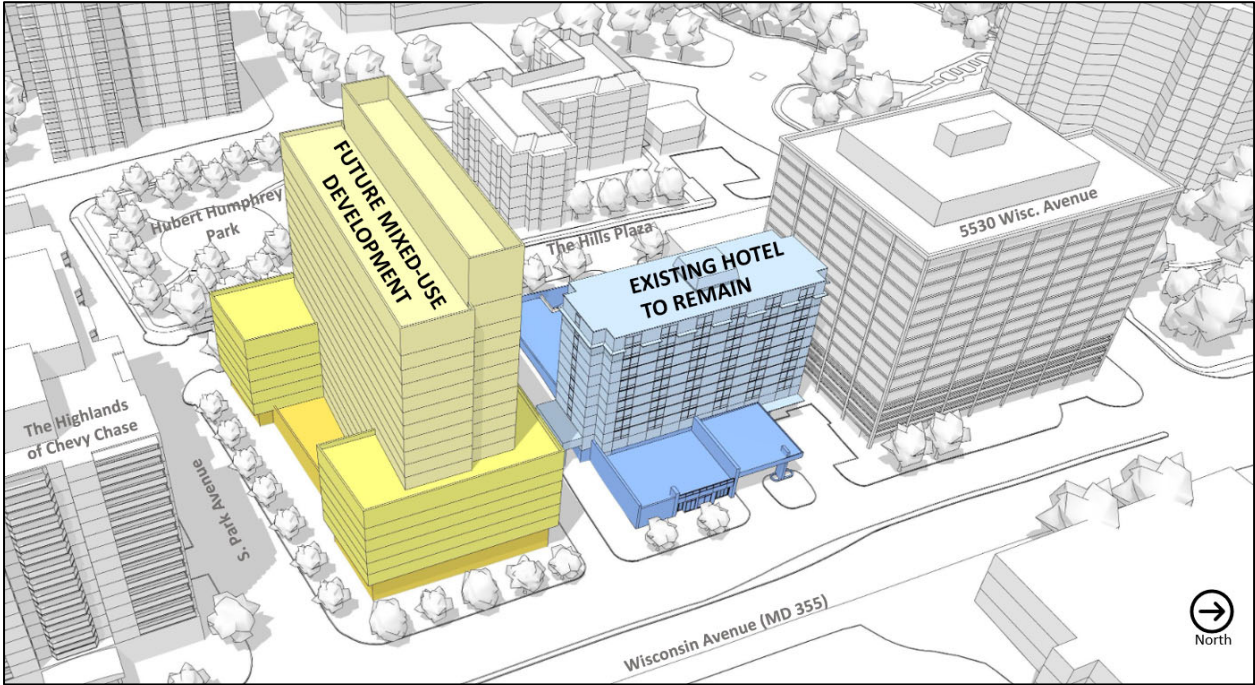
Sketch Plan massing looking west from Wisconsin Avenue
